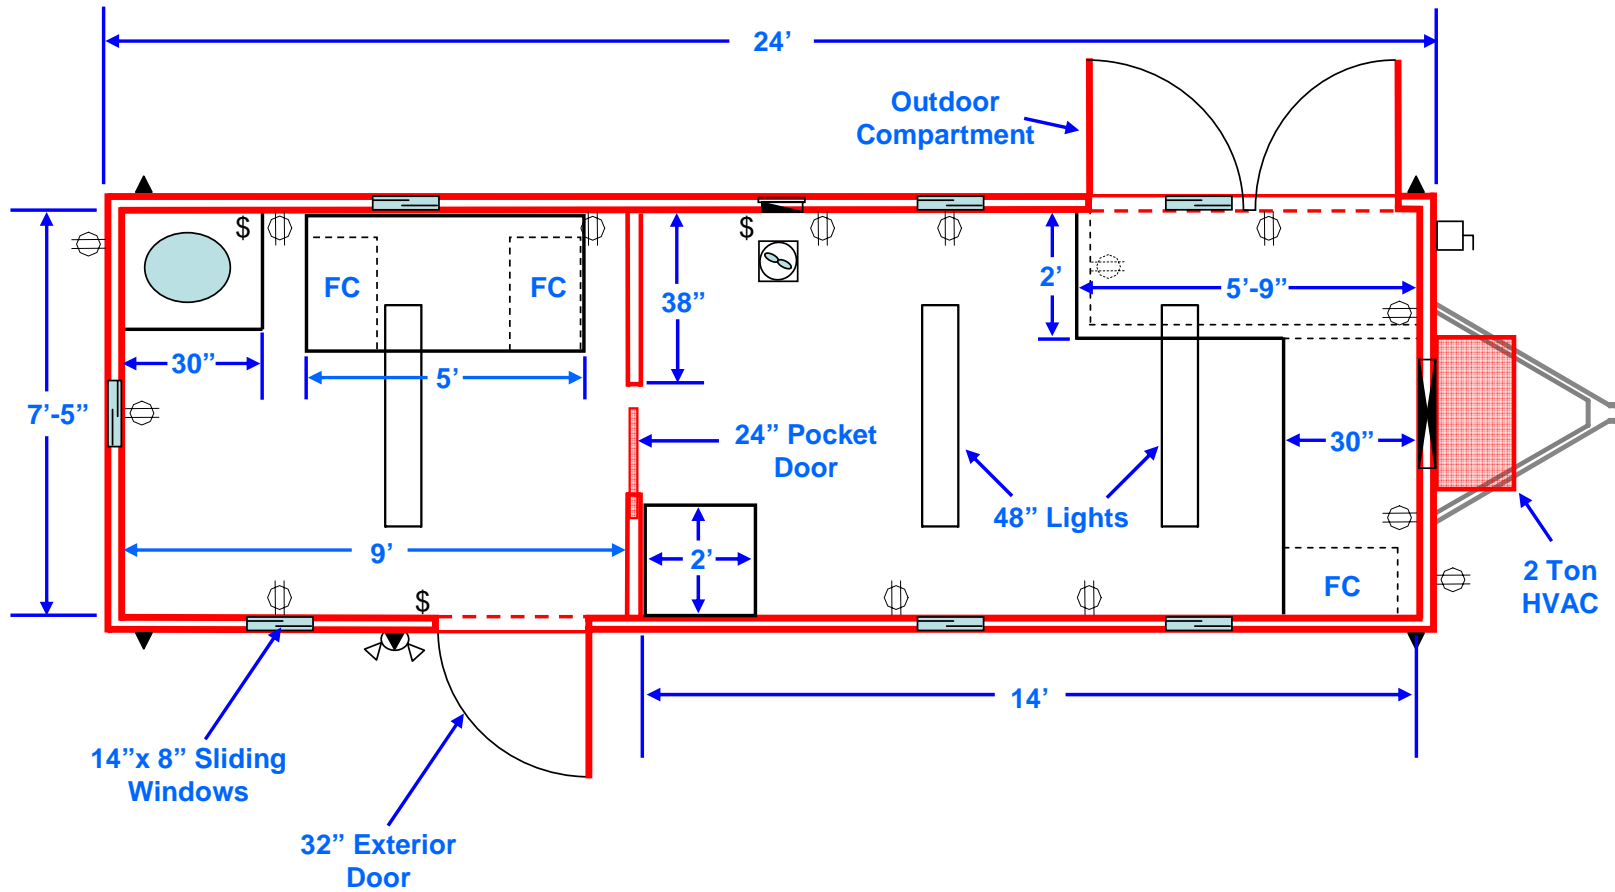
Floor plan of the OFIS. Dirty and clean ends of the lab are left and right of the pocket door.
